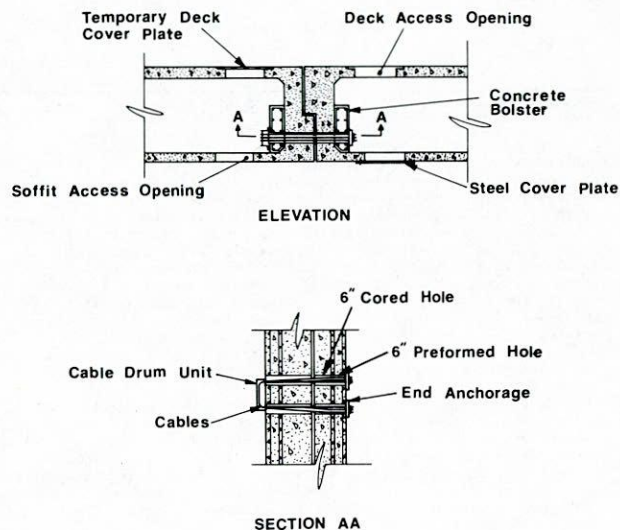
Concrete Box Girder Longitudinal Hinge Restrainer
